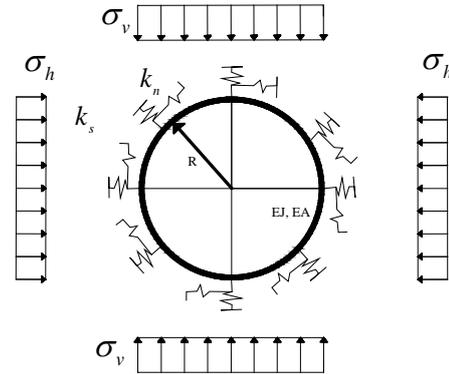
Calculation scheme of tunnel lining with the HRM method.  $\sigma_v$ : vertical load in the model tunnel – surrounding ground;  $\sigma_h$ : horizontal load in the model tunnel – surrounding ground;  $k_n$ : normal stiffness of the interaction springs;  $k_s$ : tangential stiffness of the interaction springs;  $R$ : tunnel radius;  $EJ$  and  $EA$ : bending and normal stiffness of the tunnel lining.
